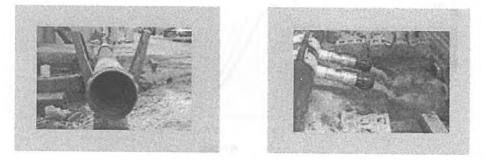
Pictures of PVC pipeline and four inch turnout structures
